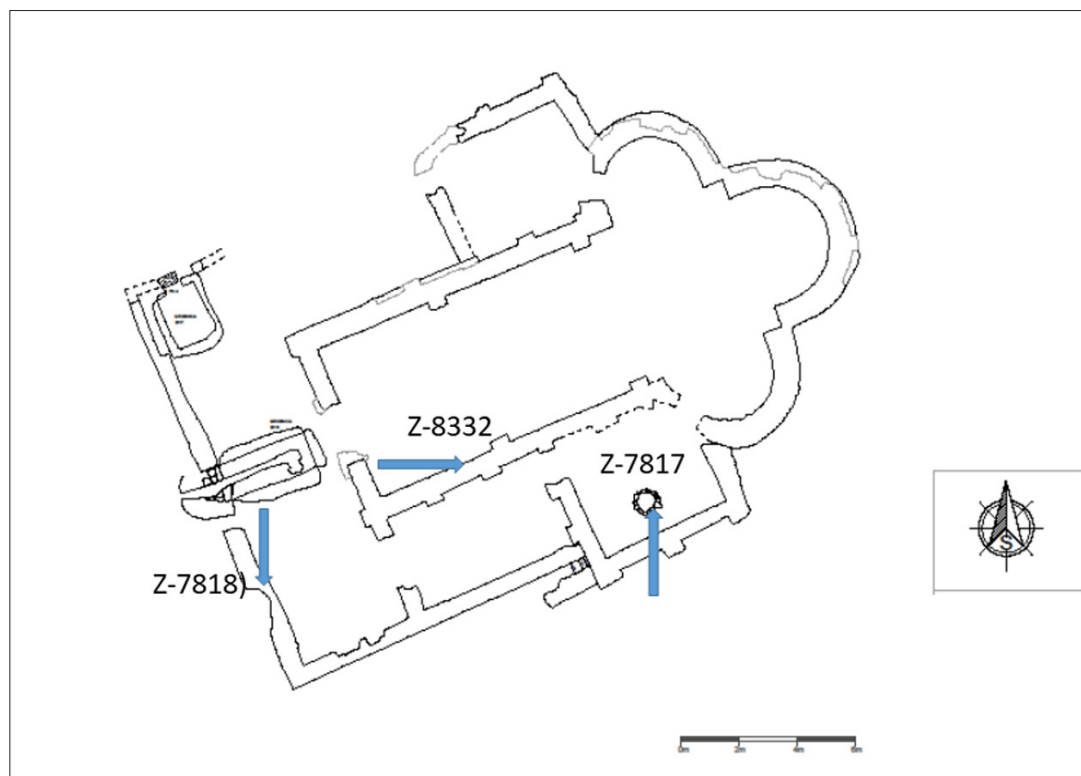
Bilice, ground-plan with locations of mortar samples: Z-7817 – baptistery, Z-7818 – west wall of the narthex, Z-8332 – south wall of the church nave (photo by M. Vuković, modification by M. Jarak).
